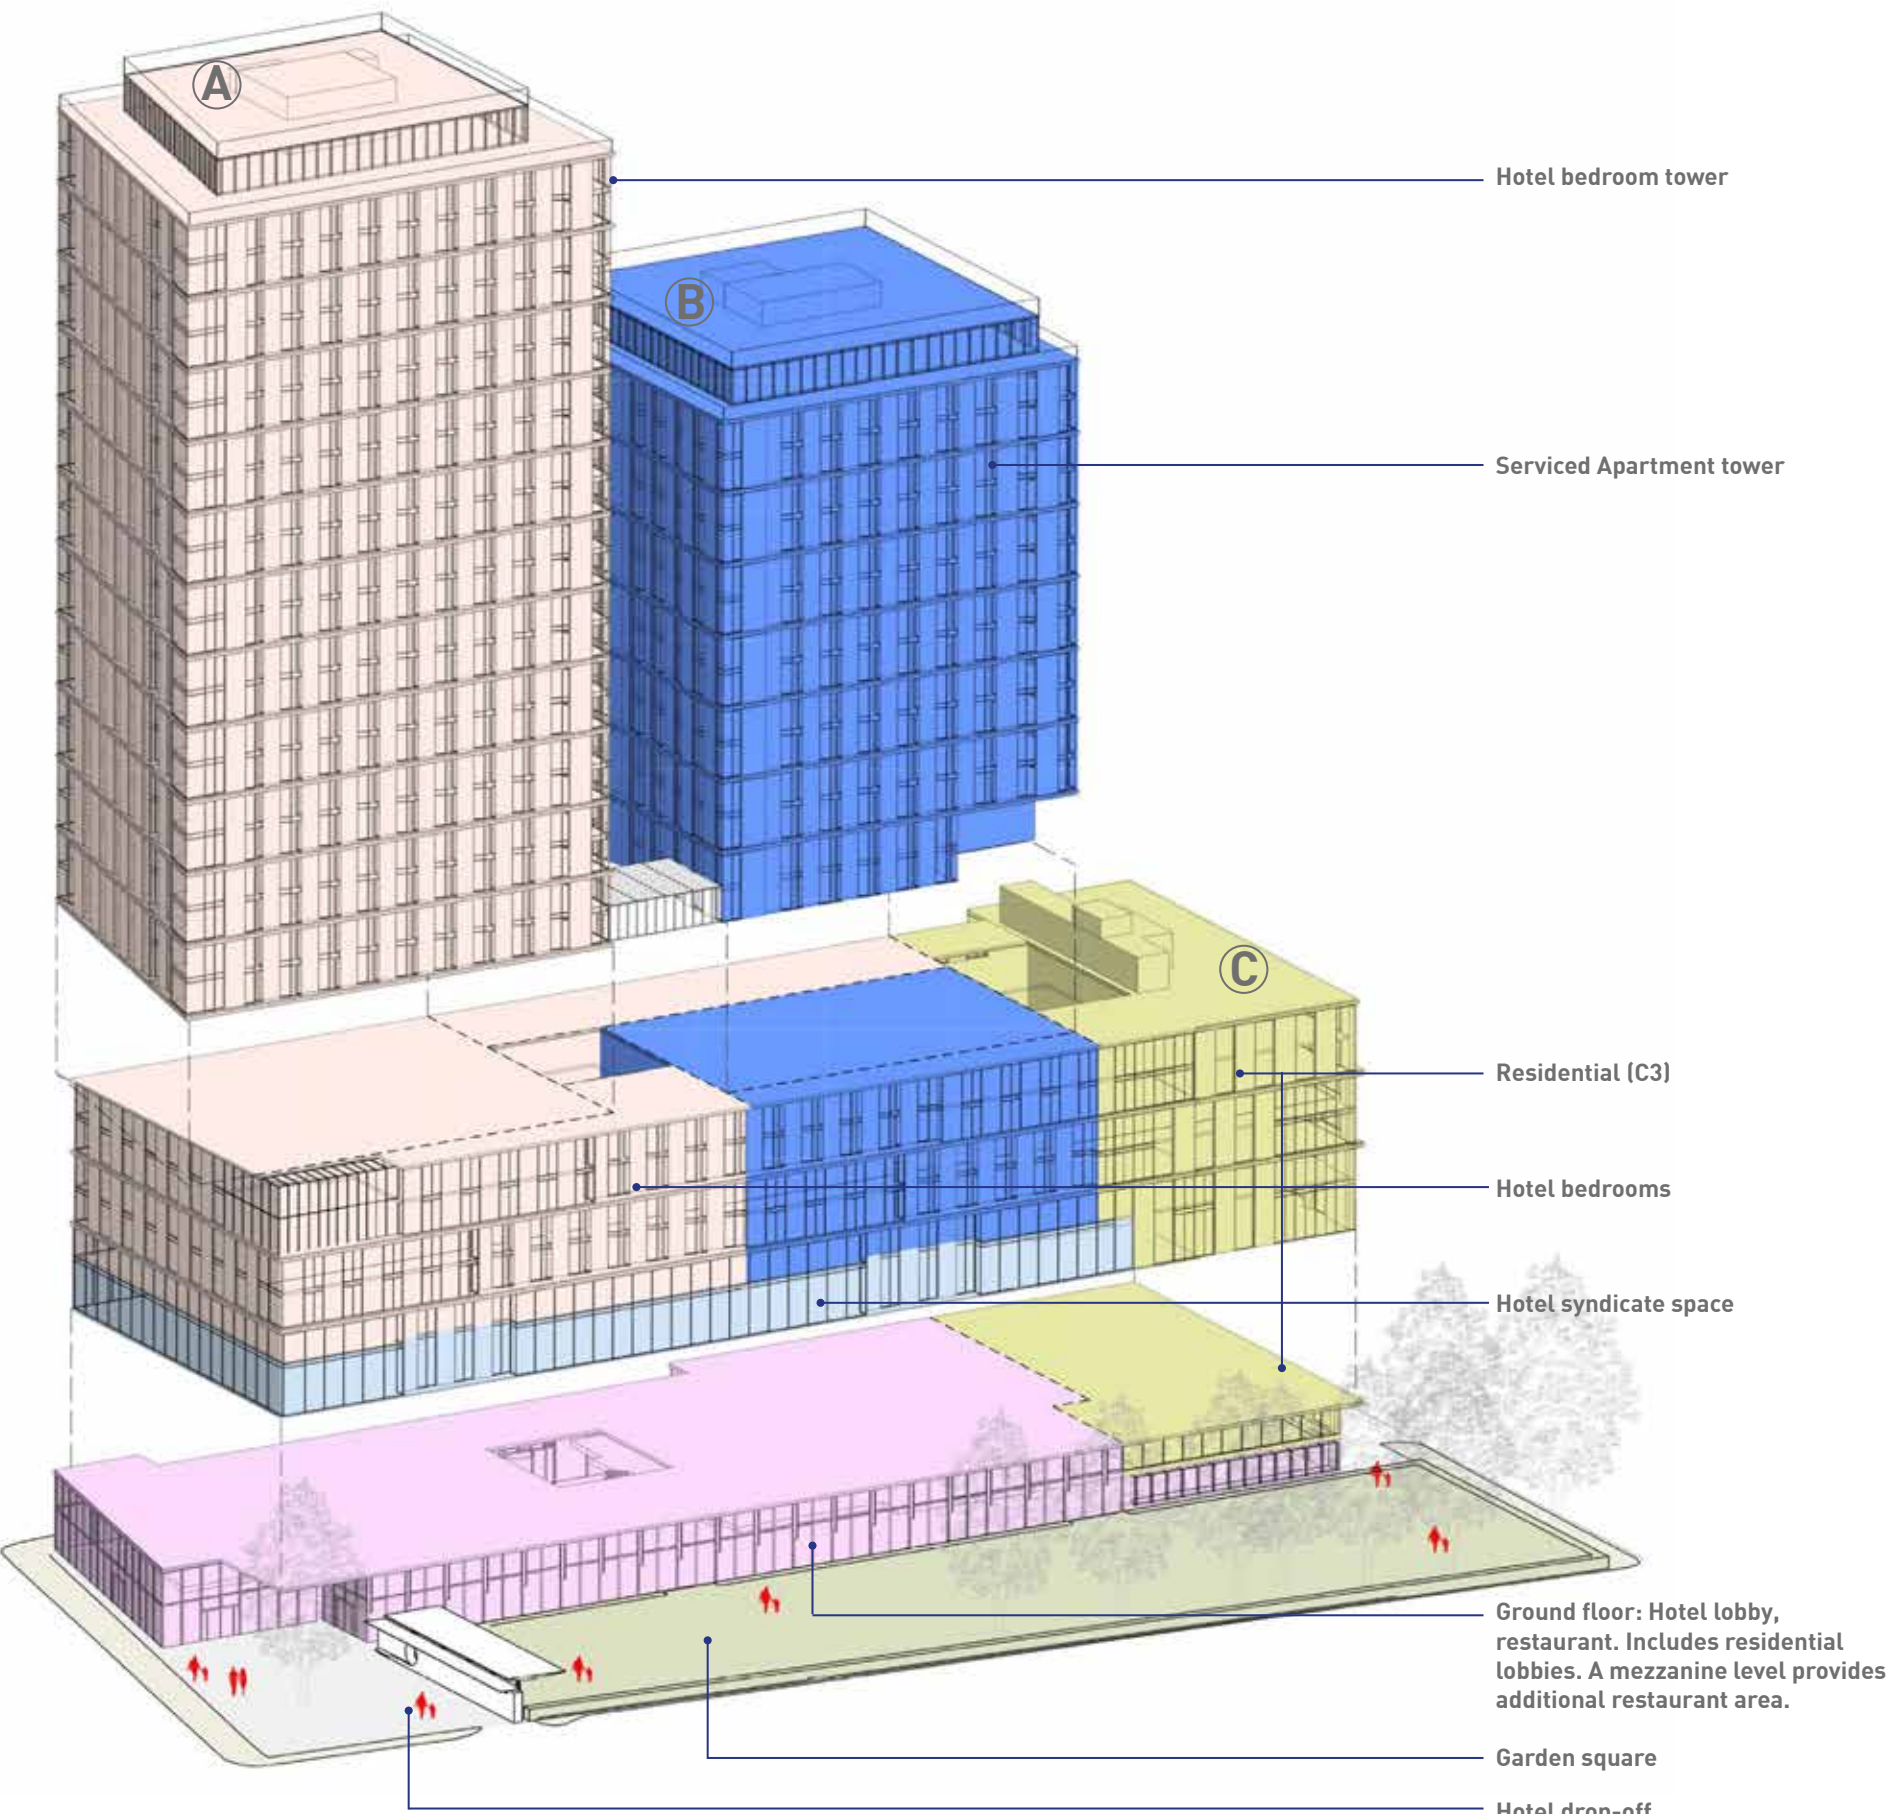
Functional axonometric of the building illustrating the distribution of the main building elements
